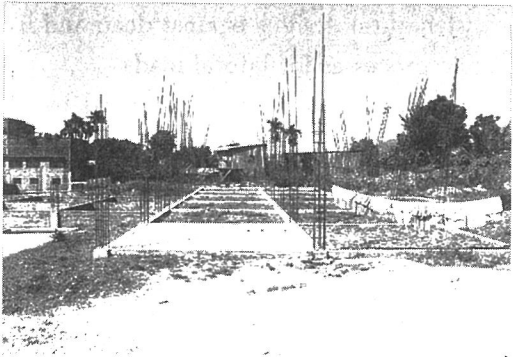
A reinforced concrete building under construction at Dharan Hospital, Dharan Bazaar, Nepal
